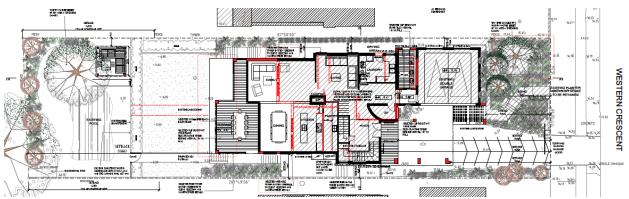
Proposed Ground Floor Plan (existing walls shown in black and proposed in red)
